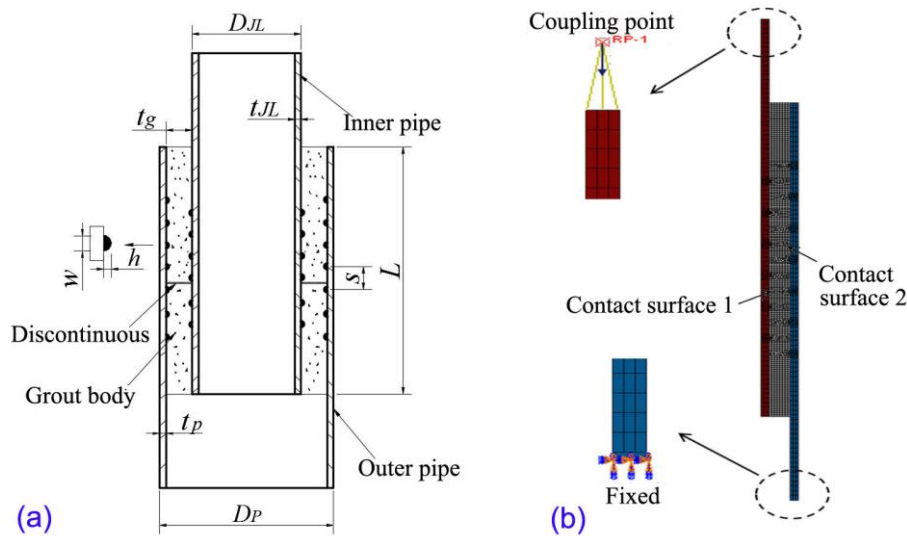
Configuration and finite element model of grouting connection: (a) Configuration; (b) finite element model
